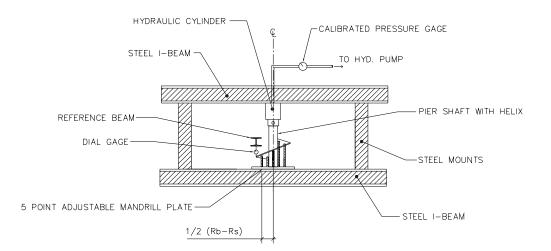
HELIX EXAMPLE LABORATORY TEST SET-UP
